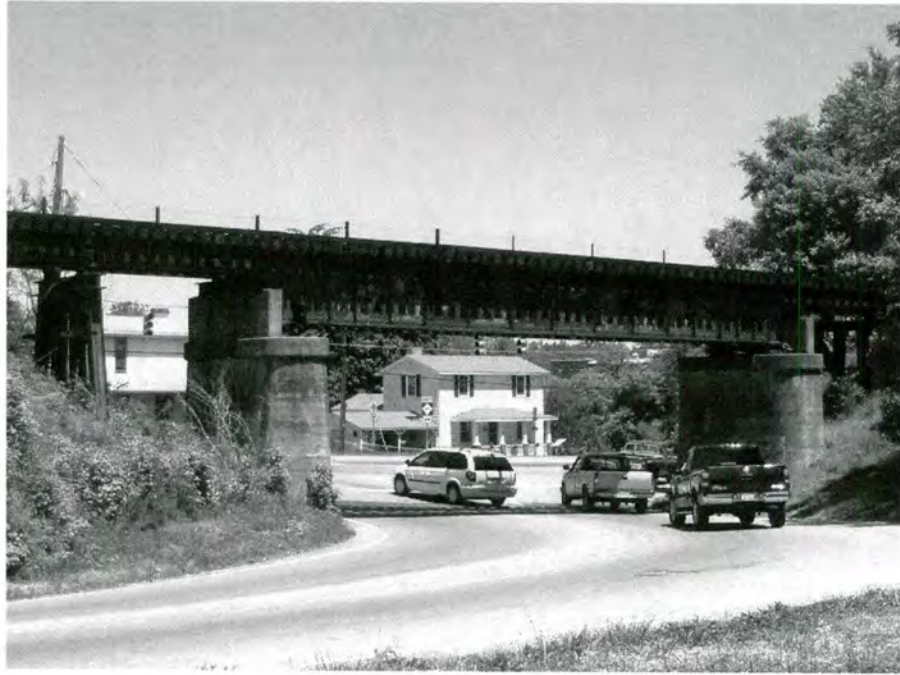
Southern Railway Bridge, Looking North Along N.C. 49 to Intersection with U.S. 70.
